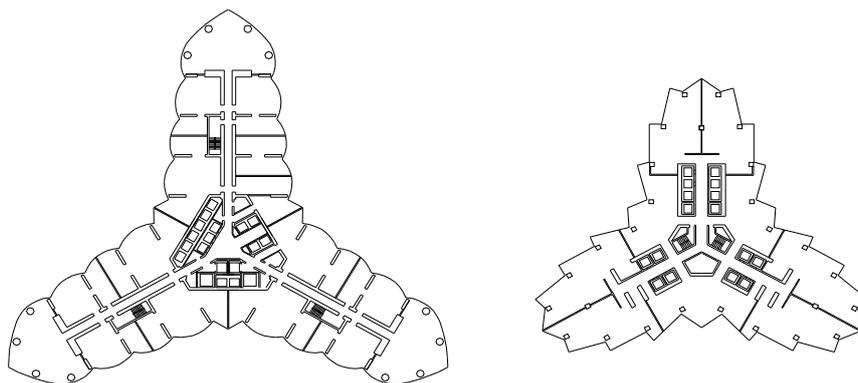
Typical Floor Plans of the Burj Khalifa (left) and Samsung Tower Palace (right).
